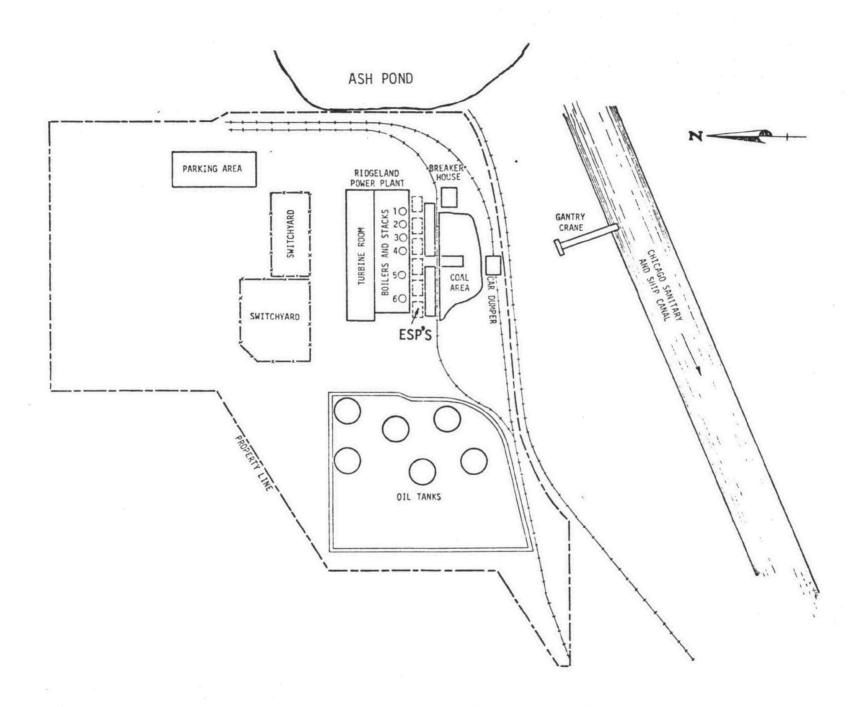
Site plan showing possible locations of new ESP's for Boilers 1, 2, 3, 4, 5, and 6 at the Ridgeland power plant.
